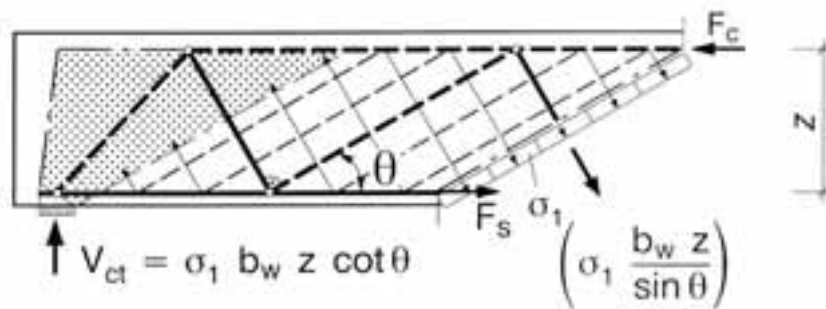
Forces and Stresses in the Discrete Concrete Struts between the Inclined Cracks
